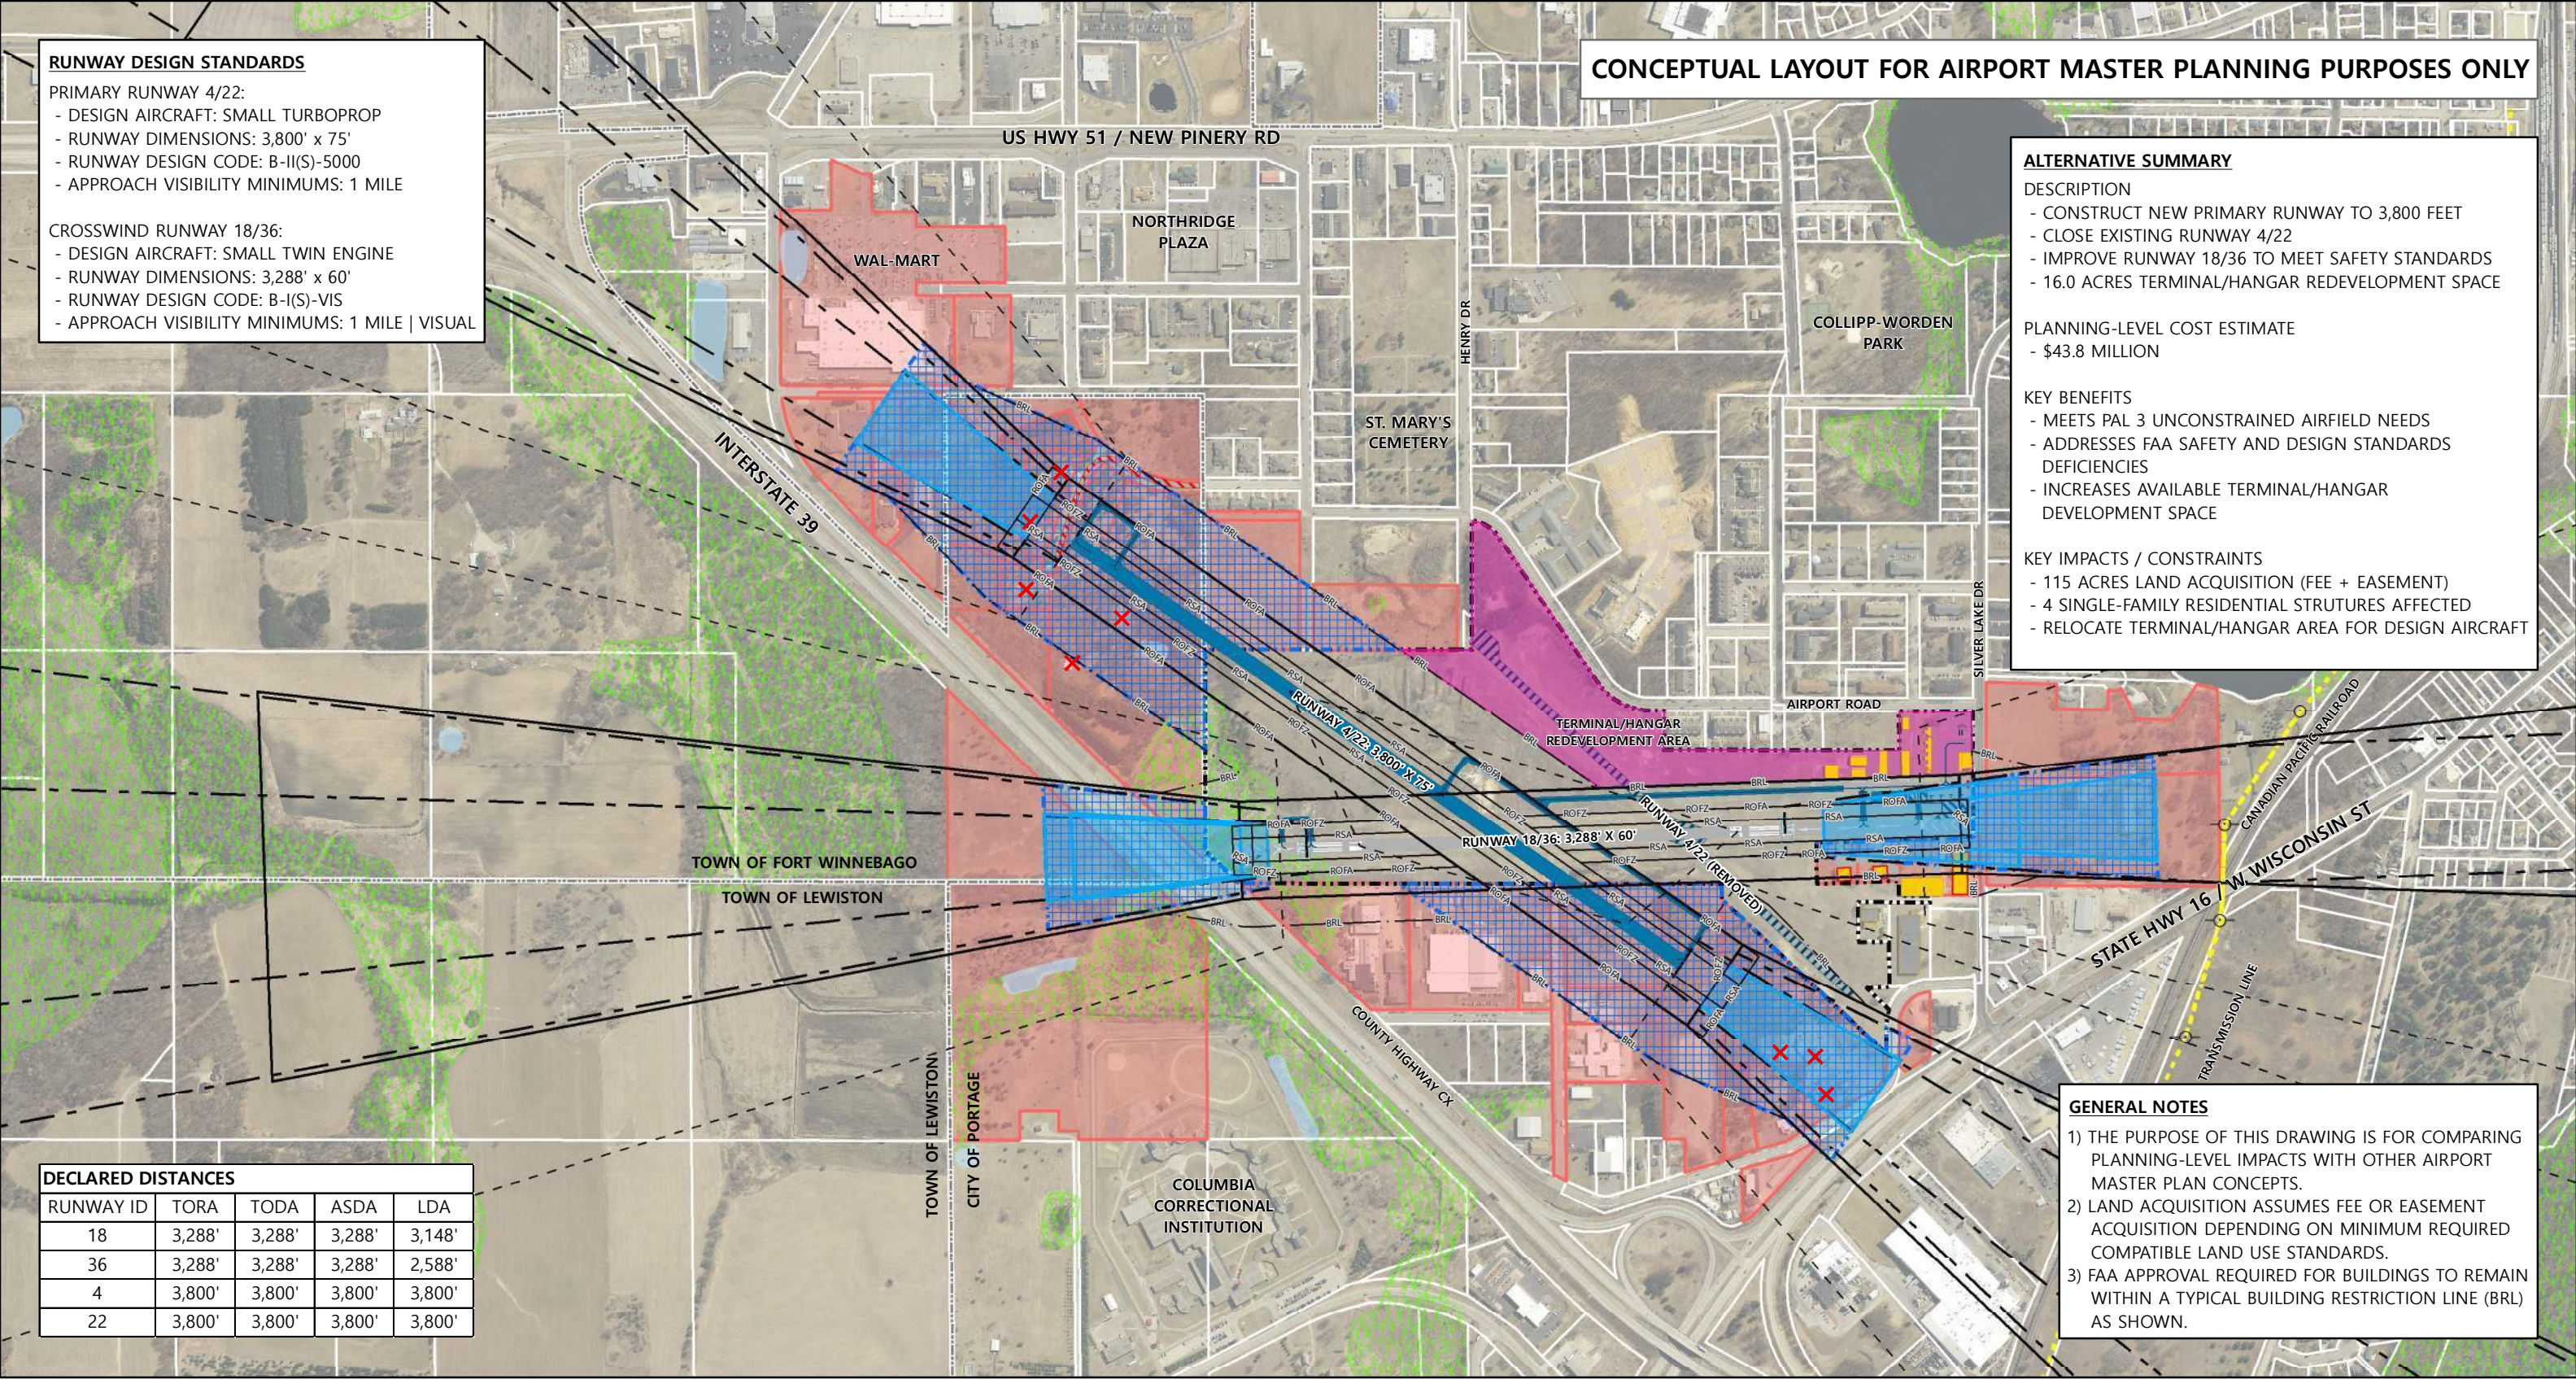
ALTERNATIVE 3B - CONSTRUCT NEW RUNWAY TO 3,800 FEET (REVISED)
